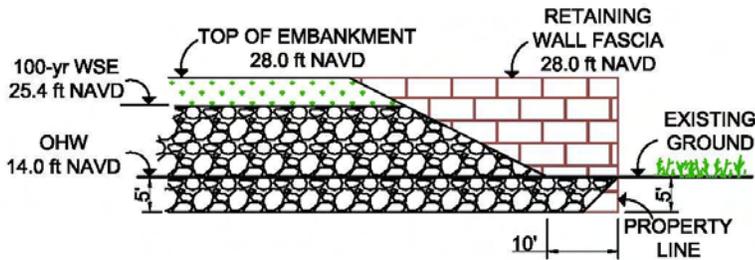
Bioengineered Shore-Protection Structure Detail with MSE Retaining Wall on Property Line – Southwest Corner
